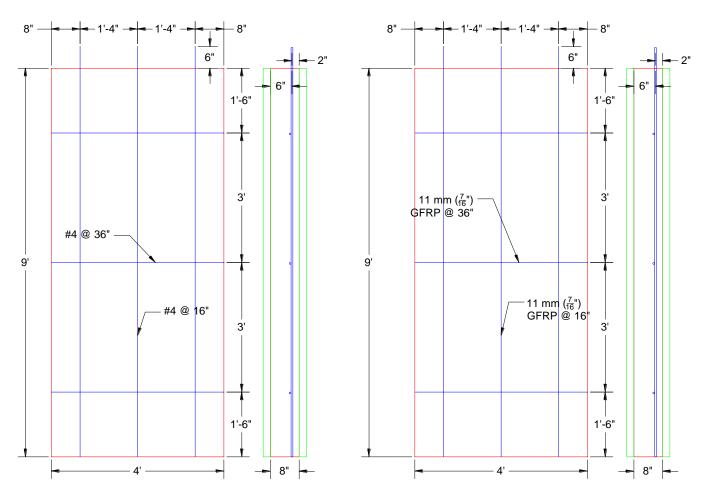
Configuration of the tested ICF wall panels with steel reinforcement (left) and GFRP reinforcement (right)
